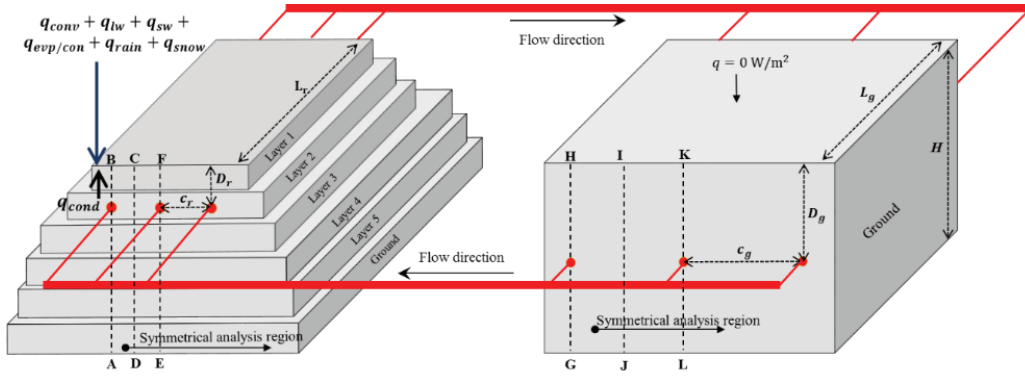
Schematic view of the hydronic heating pavement system coupled to the horizontal ground heat exchanger.
